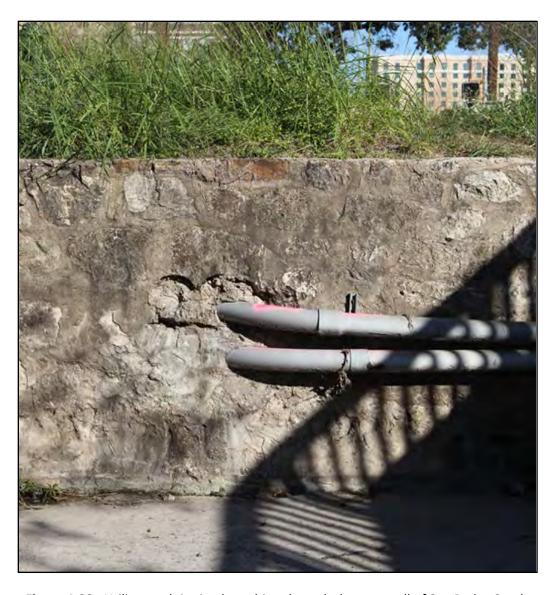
Utility conduit pipe breaching through the east wall of San Pedro Creek.
